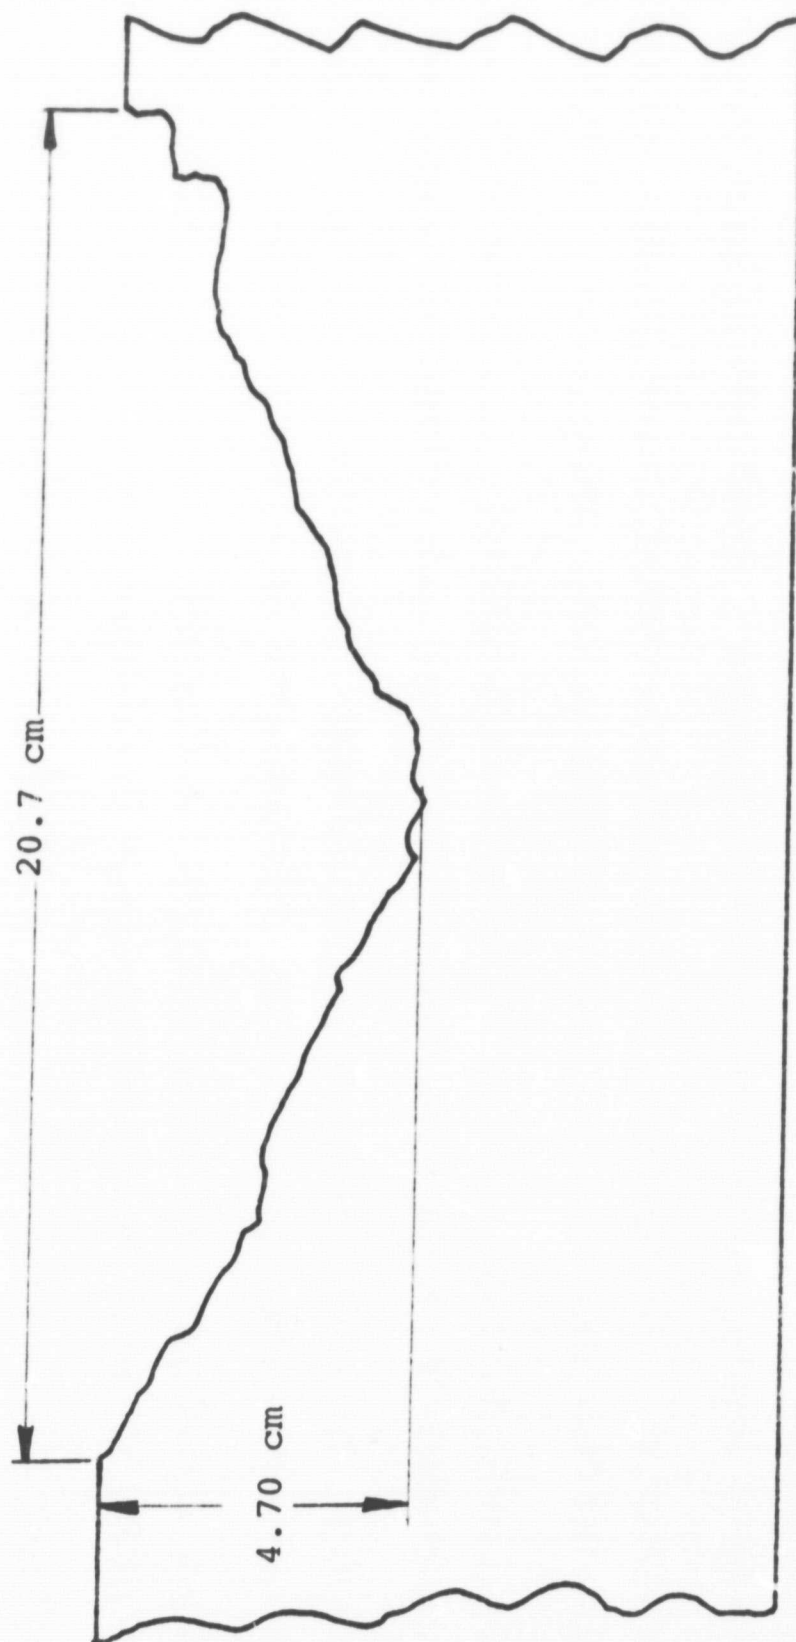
CROSS SECTION OF CRATER FORMED BY IMPACT OF
